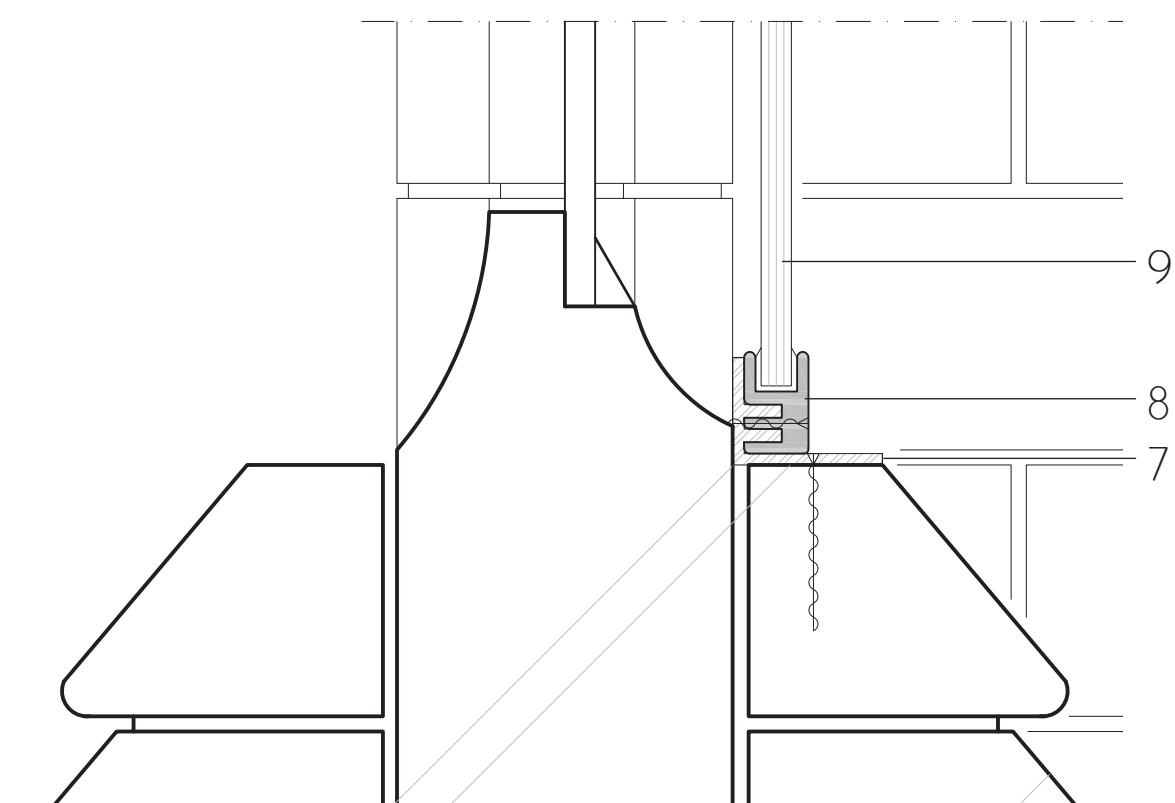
GUTTER AND ISOLATION ROOF - 1:5
